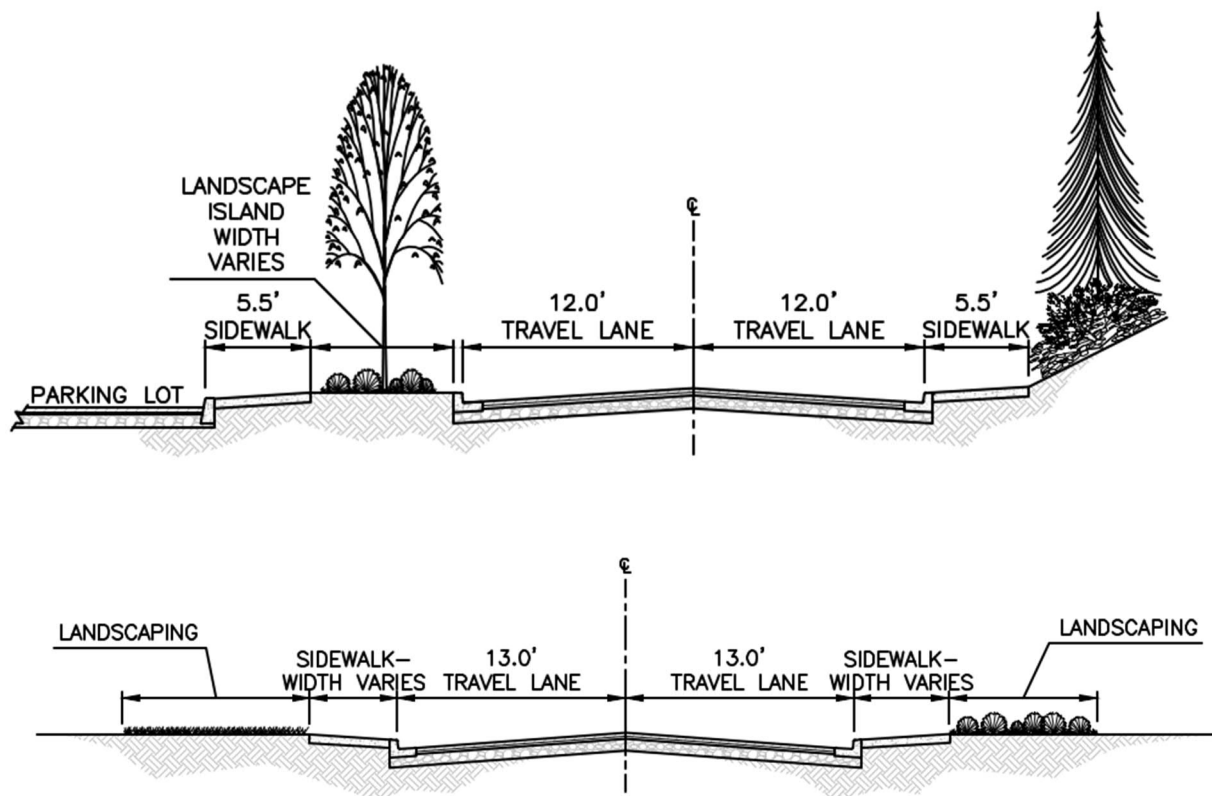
Conceptual Cross-Sections east of the East Parking Garage (top) and west of proposed West Pavilion (bottom)
